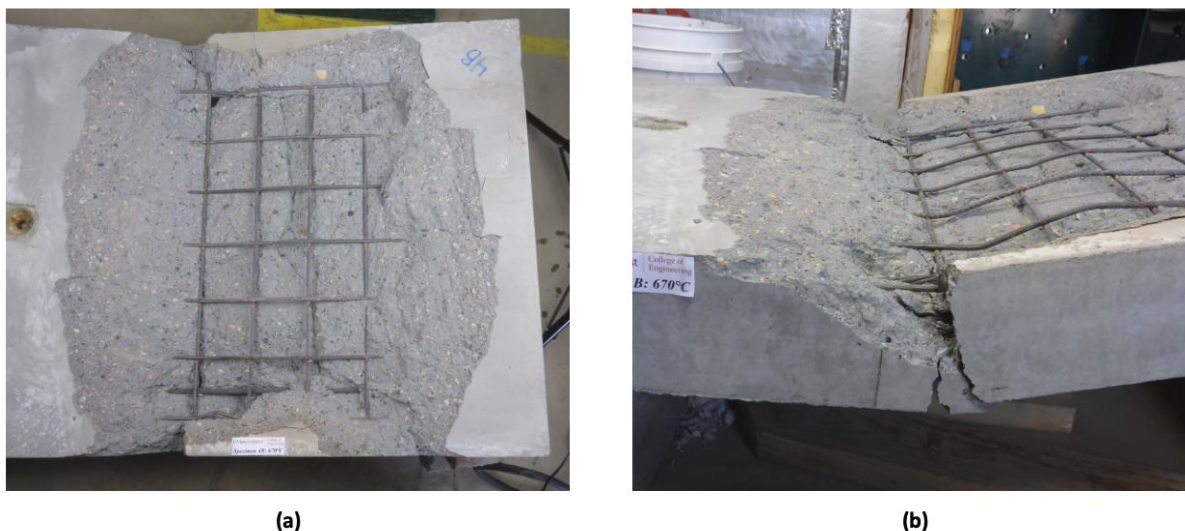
Concrete slab specimen CS-1F explosive spalling at 670°C (1238°F) (a) top view (b) side view)
